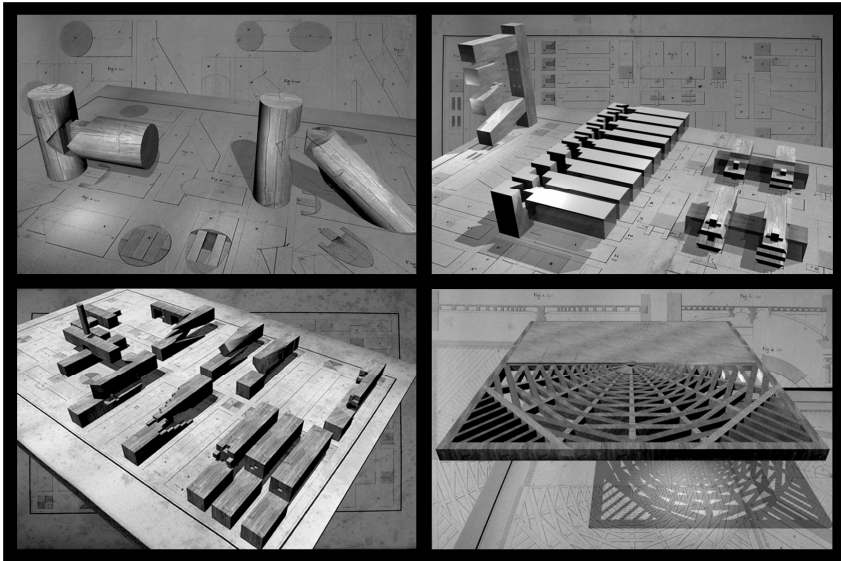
Three-dimensional plans of some meaningful joints. An application: wooden beam floor in the manner of Serlio. (Emy, 1856, reference plates: 16, 17, 19, 35)
